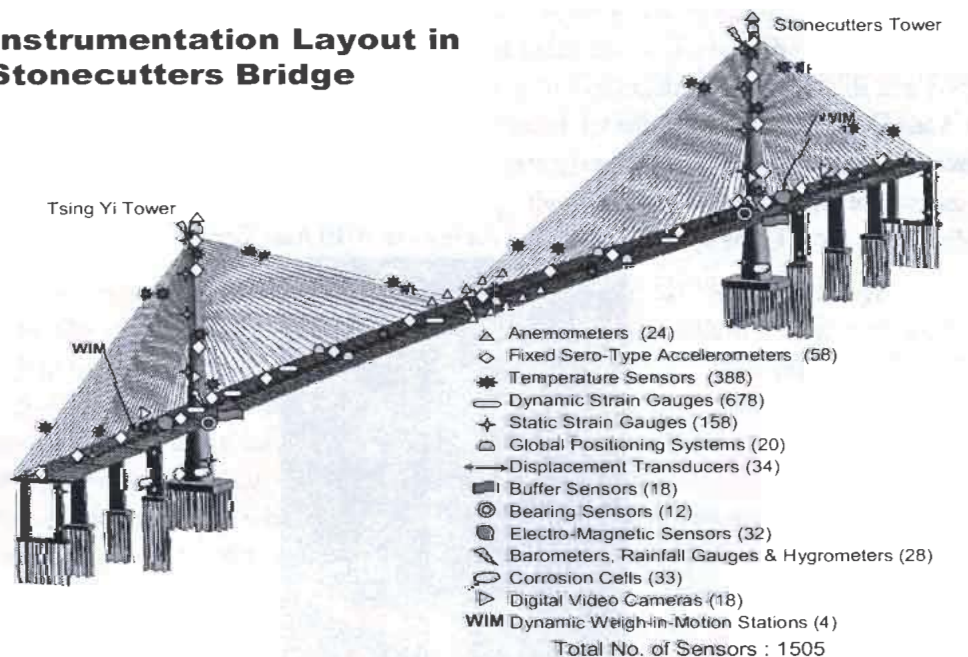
Instrumentation Layout in Stonecutters Bridge<sup>9</sup>.
